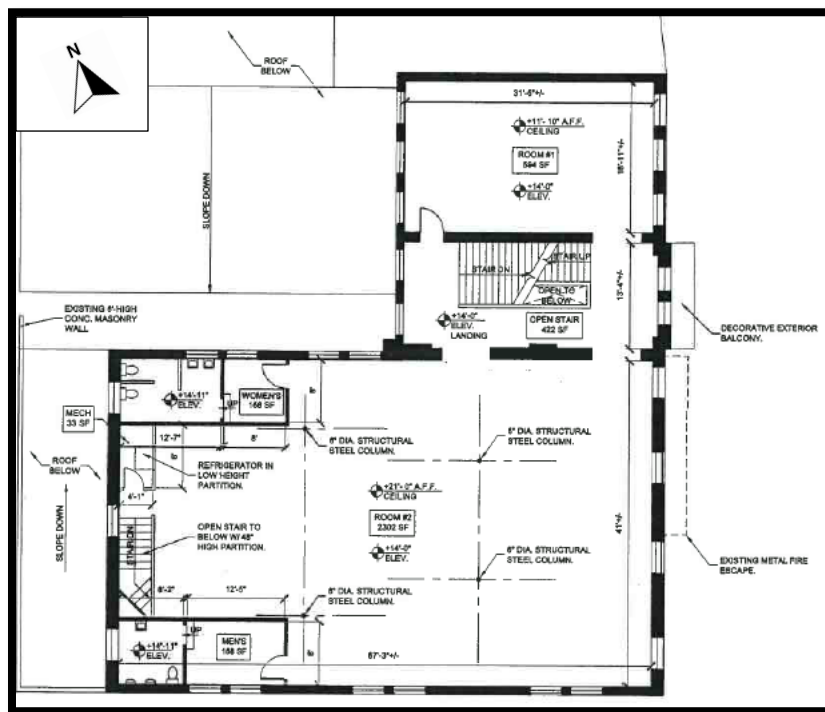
635 6<sup>th</sup> Avenue, City Hall, Second Floor
